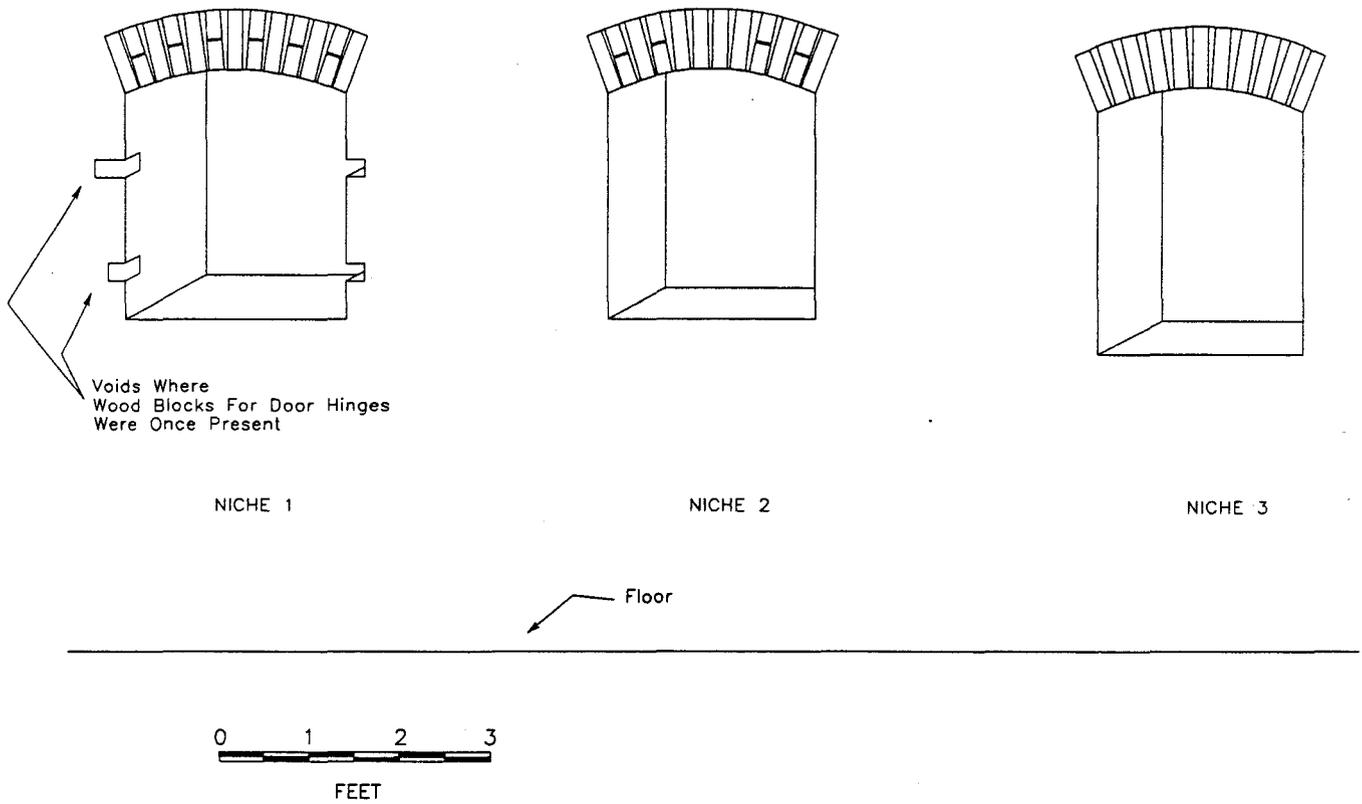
Detail of wall niches within the cellar of the Wine Press Building.
